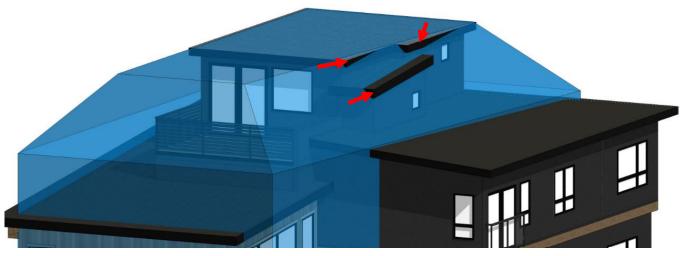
Rear angle of the eaves projecting beyond the Building Envelope.
